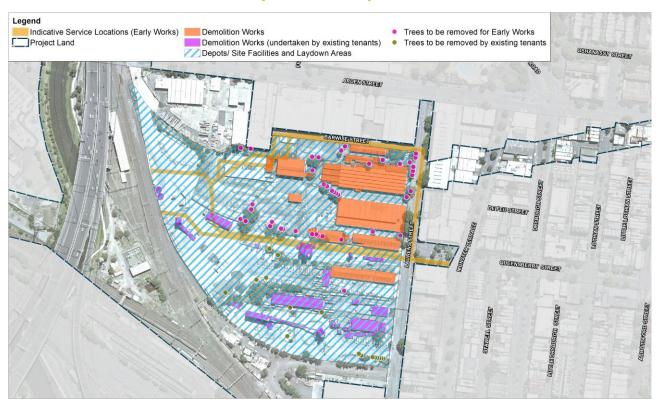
Excerpt from the Site Layout Plan which identifies Early Works within the Arden Station Precinct (refer to Appendix 1).
